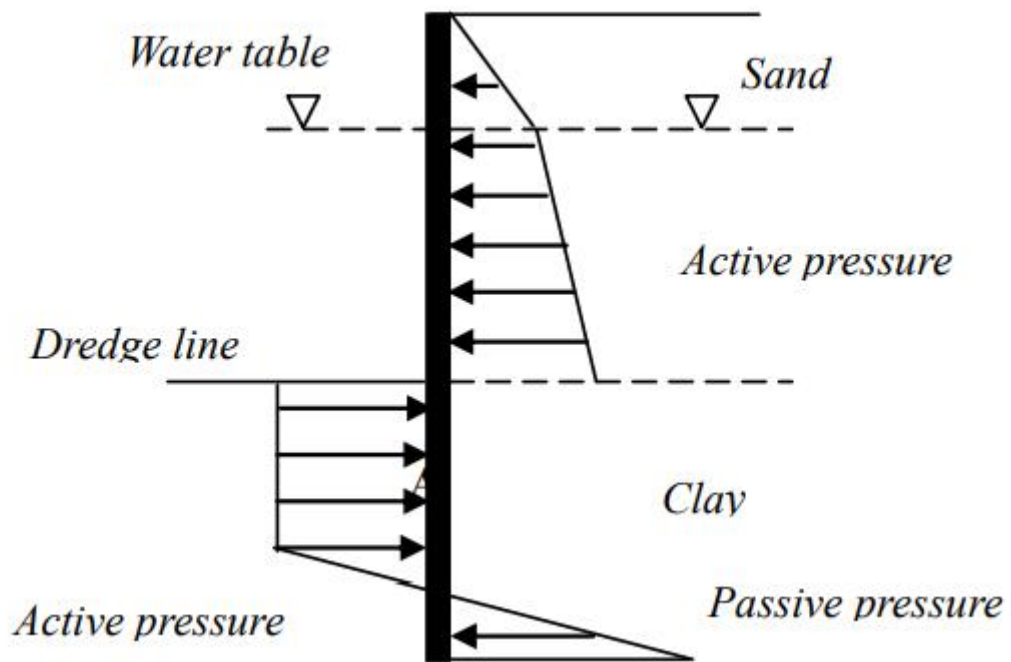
net earth pressure diagram of a cantilever sheet pile penetrating clay soil [25].
